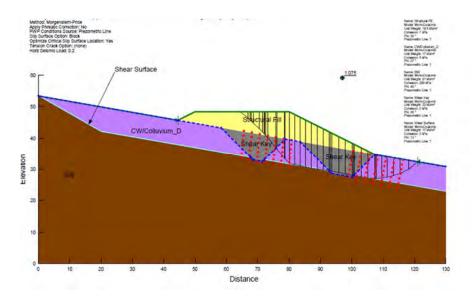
Indicative design concept for embankment crossing existing landslide south of Kauri Eco-Viaduct.
